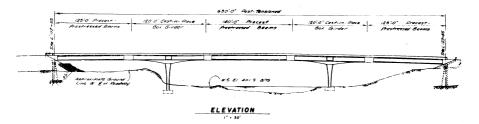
Elevation of Louis Pierce's Stewart Park Bridge.
